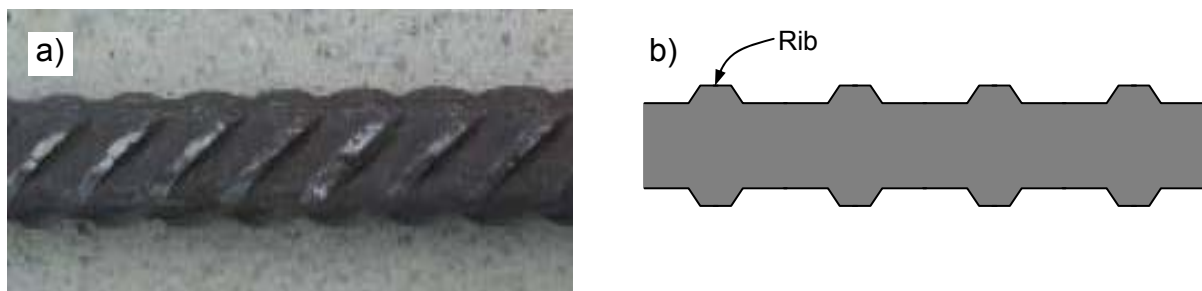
Ribbed reinforcing bar: a) Photo; b) Schematic
